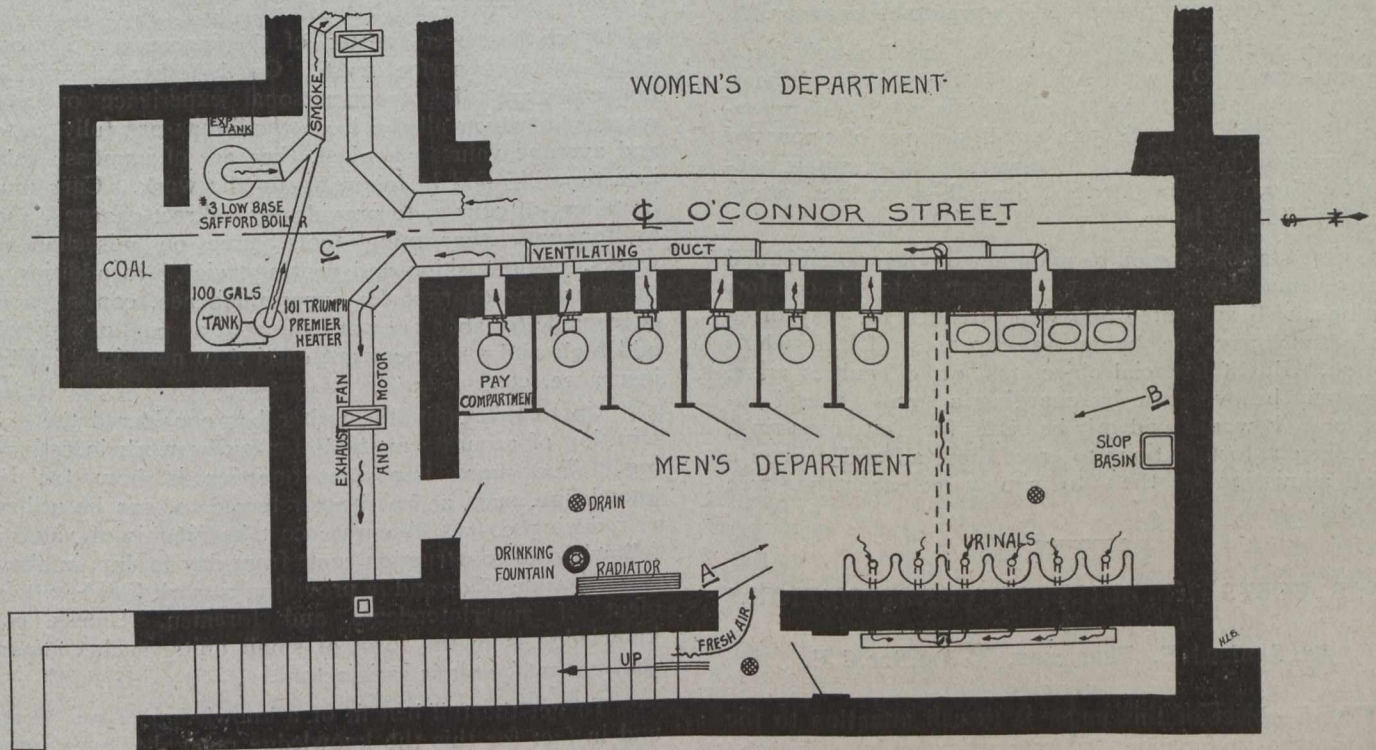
Half Floor Plan of Ottawa Public Comfort Station, Showing General Arrangement of Fixtures, Heating Apparatus and Methods of Ventilation.
